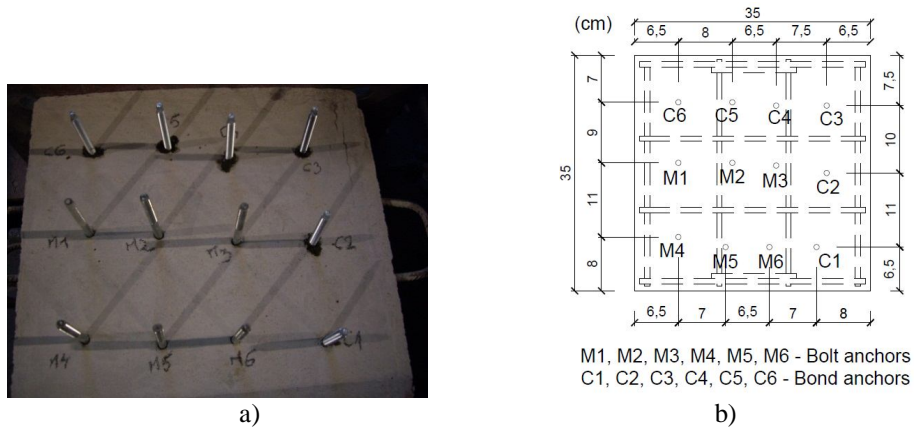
Anchors positions: a) on cracked specimen; b) toward reinforcement M1...6 bolt anchors; C1...6 bonded anchors.
